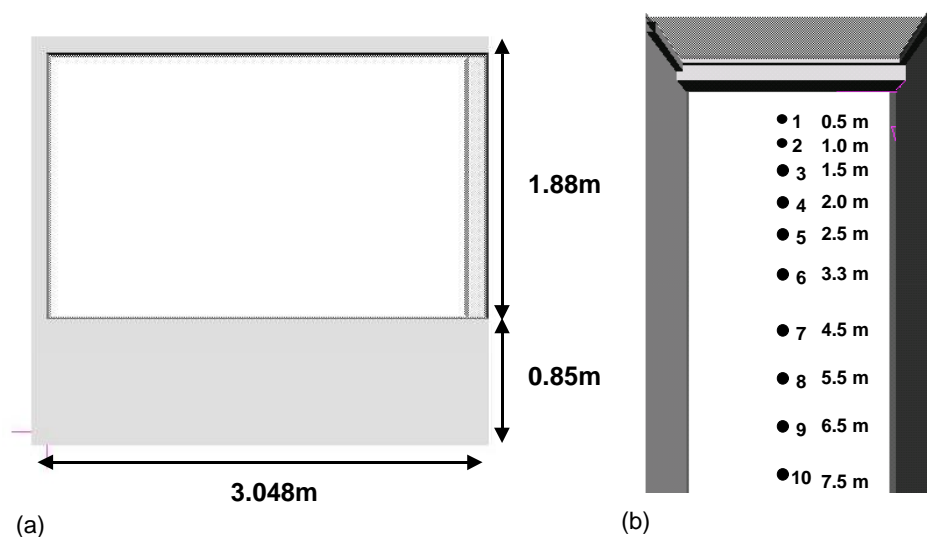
Facade view (a) and floor plan (b) of the peripheral office geometry.
